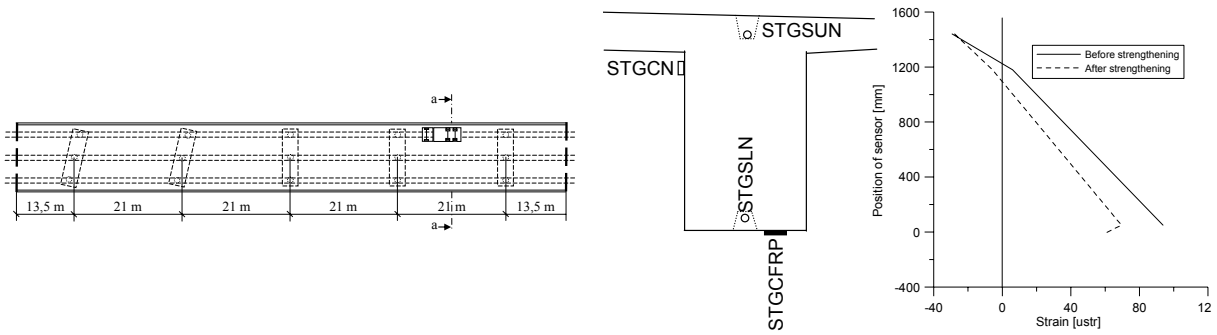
Placement of the truck for the static load test, left, and strain field in the north beam, right
